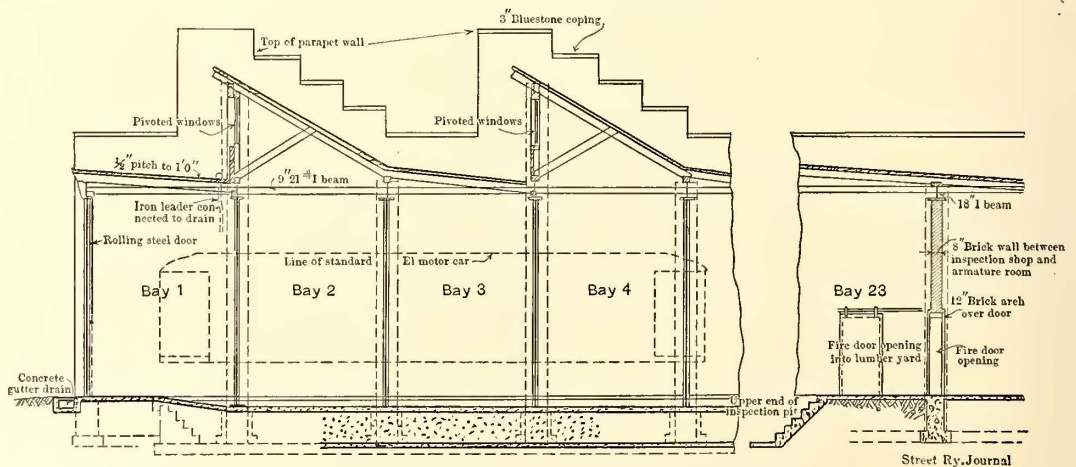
PART LONGITUDINAL SECTION OF THE INSPECTION SHOP AND ADJACENT ARMATURE ROOM
